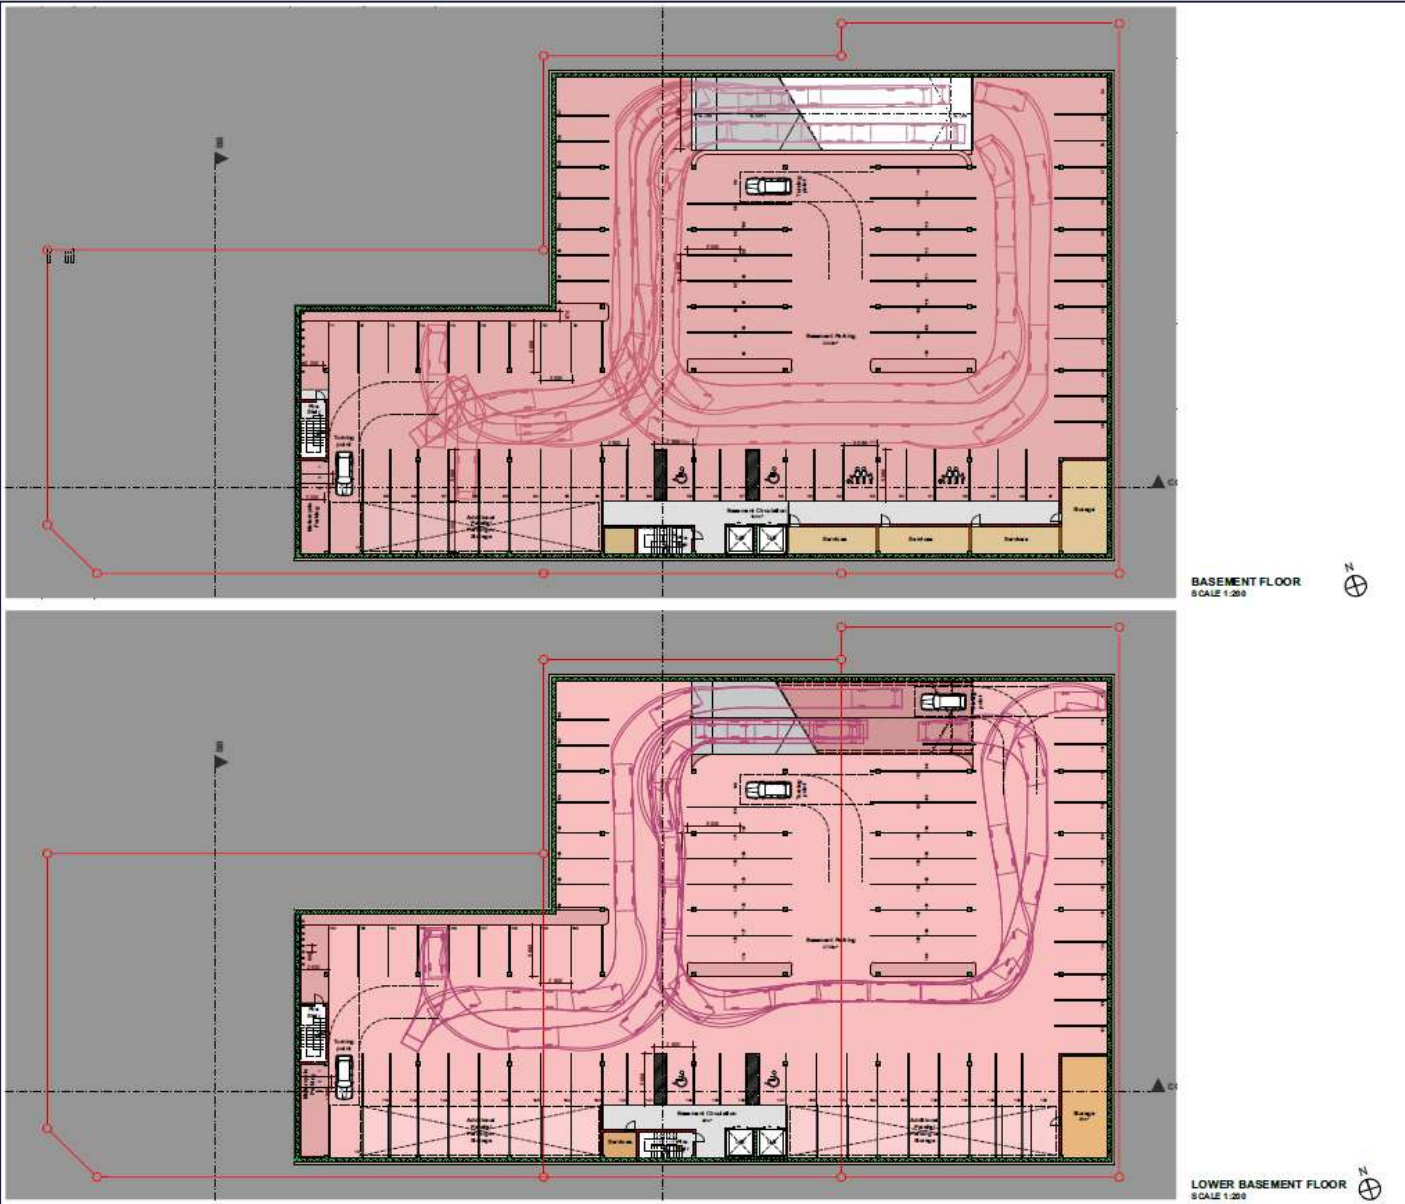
Site Development Plan – Basement and Lower Basement Parking (Source: FC Holm Architects)
